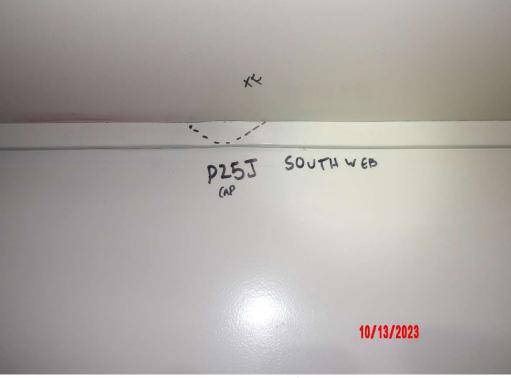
Pier 25J, South Face, Deformed Backing Plate
